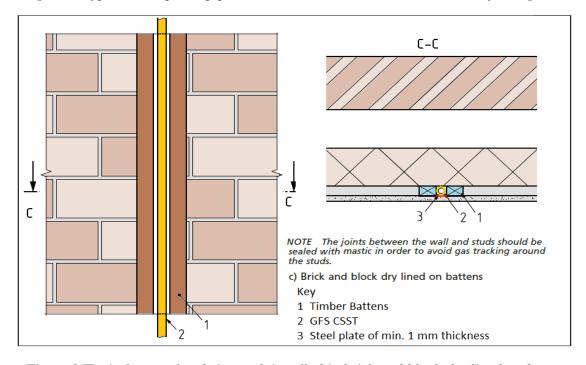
Typical example of pipework installed in brick and block dry lined on battens
